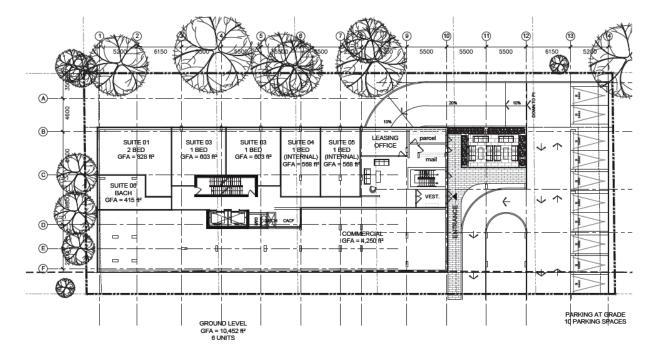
Ground floor plan showing the entrance to the below grade parking. The southeast portion of the site serves as private gardens to the ground floor suites 1-5. Source Hobin Architecture 2020
